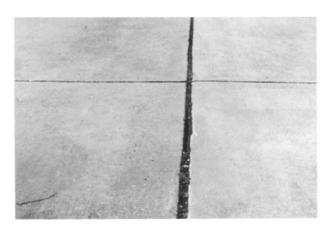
High-Severity Joint Seal Damage (Complete Loss of Sealant; Joint is Filled with Incompressible Material)
